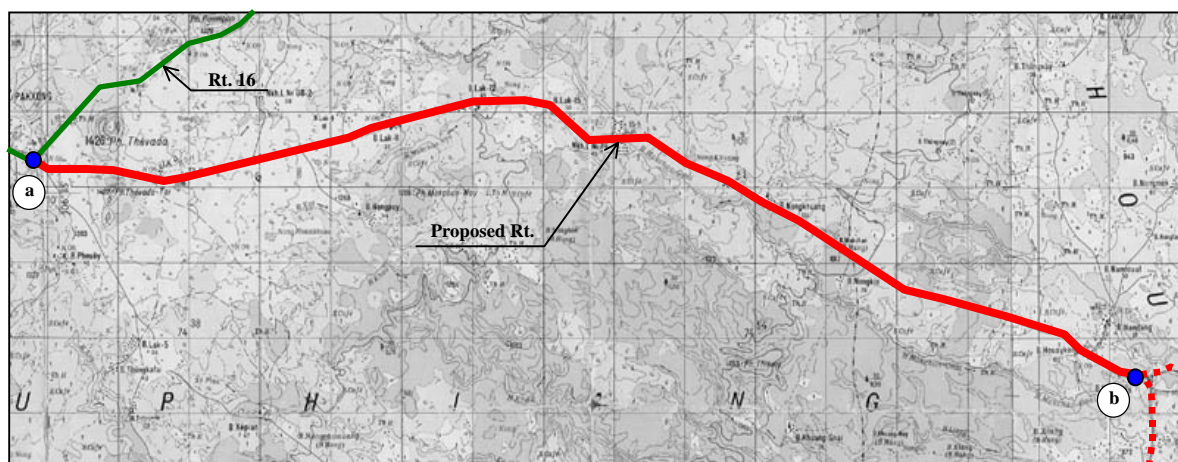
Proposed Route for STA. 0+000 – STA. 33+800 (a – b)
